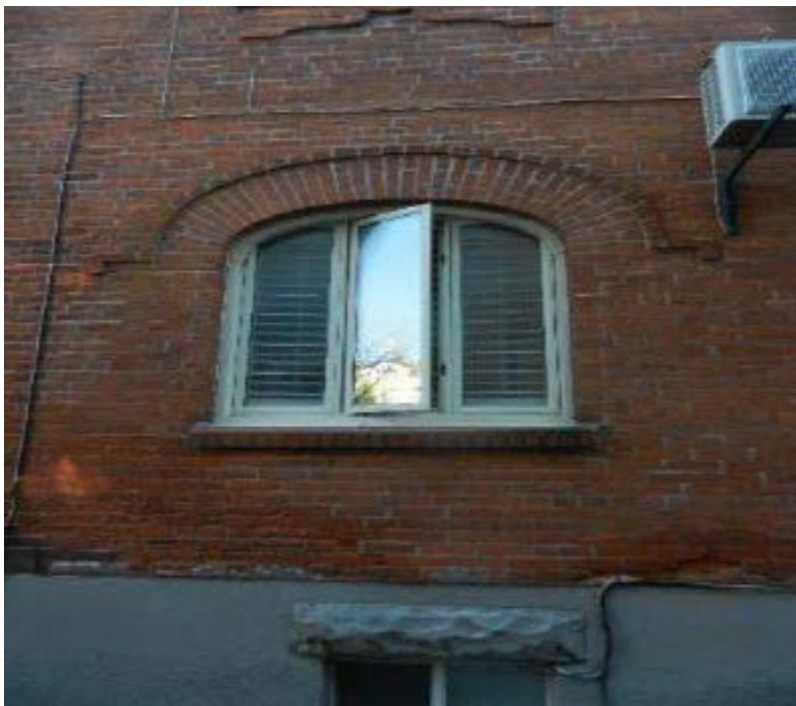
Detail of the single round arched opening on the west elevation including the decorative brick detailing (AREA, 2020)
